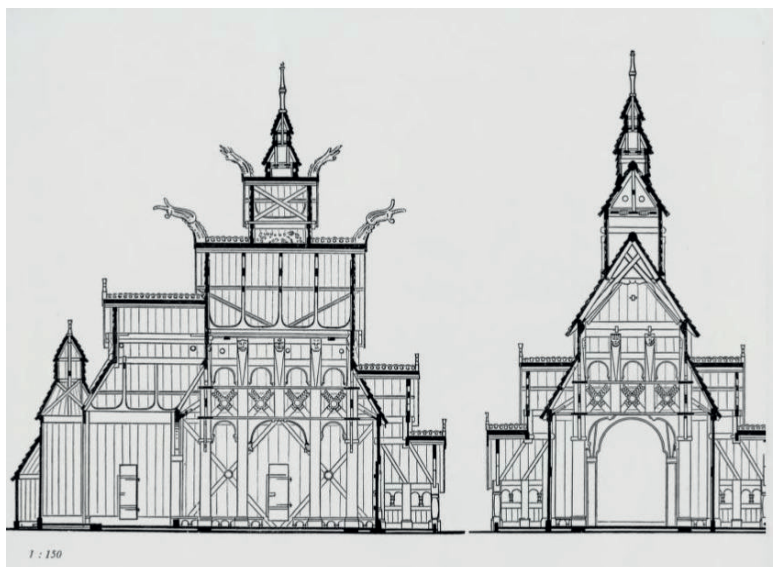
Drawings of the Gol Stavkirke: side view (left) and front view (right)
